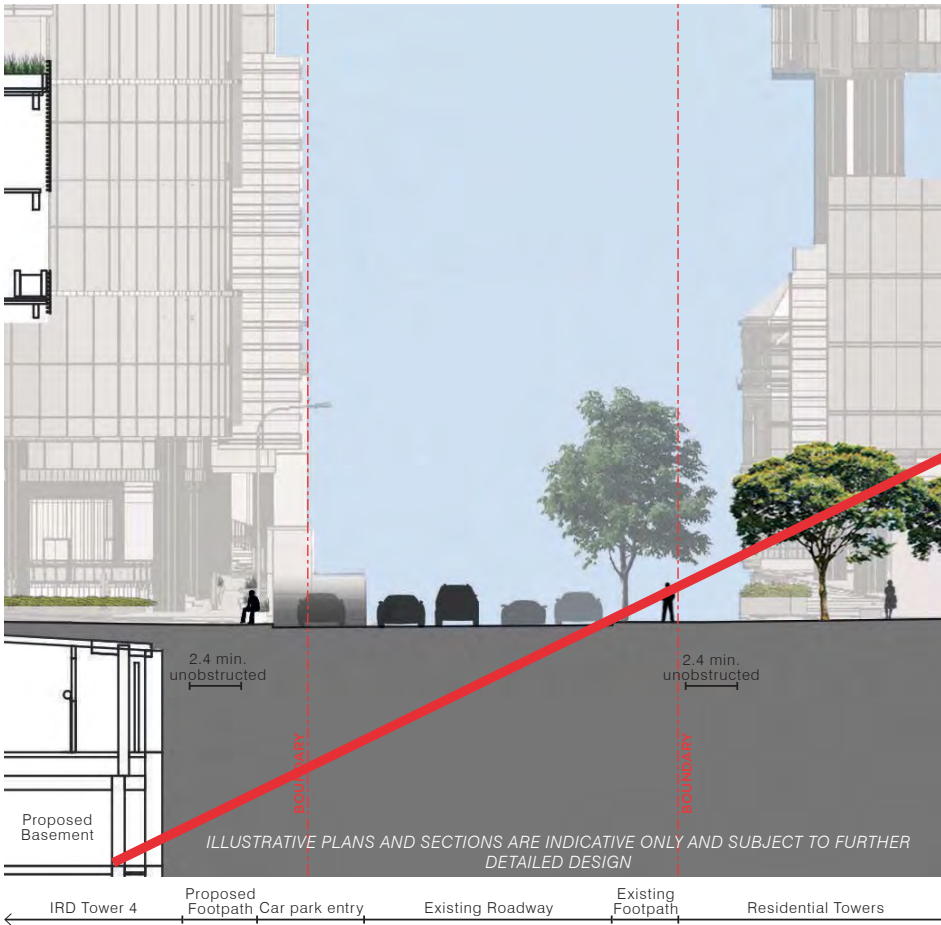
Margaret Street sectional elevation at William Street intersection looking North
